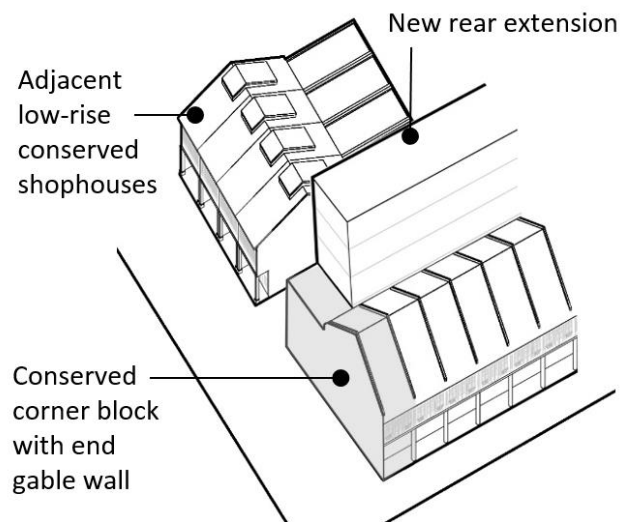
Revised allowable envelope for corner units with end gable wall
